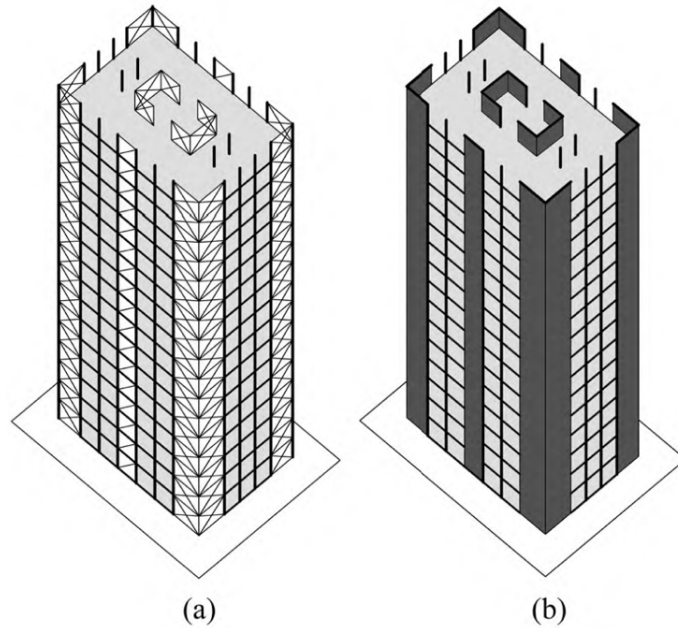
Shear frame systems: (a) Shear trussed-frame (braced-frame) system; (b) Shear walled-frame system (source: [2])
